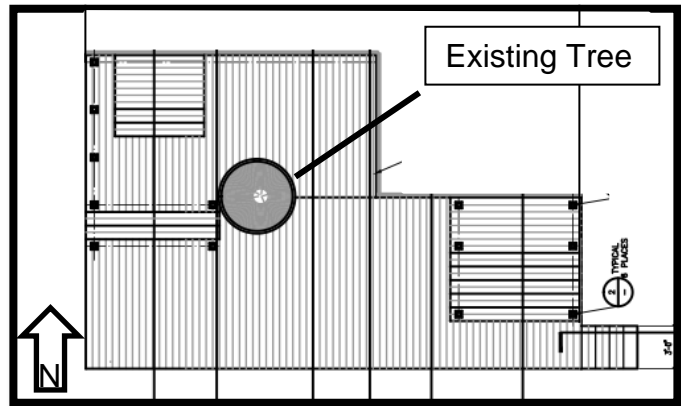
The floor plan of the proposed raised deck on the south elevation at the back of the house.
